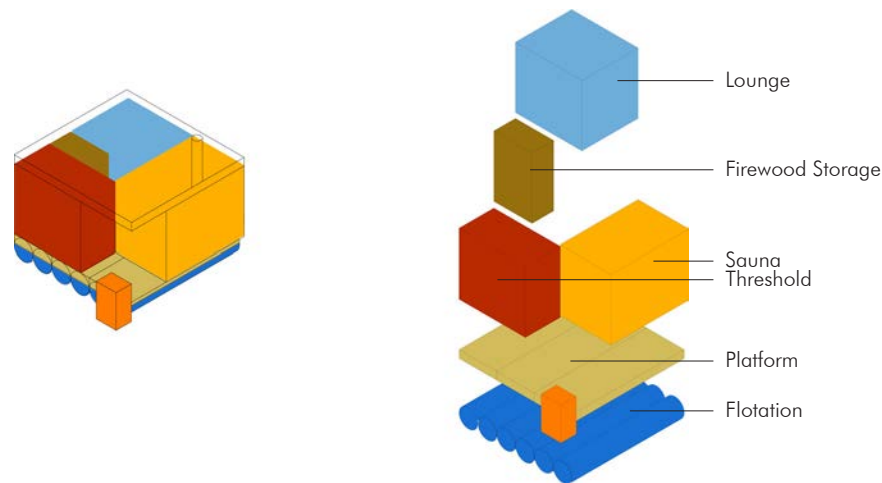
(left) Axonometric program drawing of the conversation sauna. (right) Exploded axonometric program drawing. Drawing by author.
